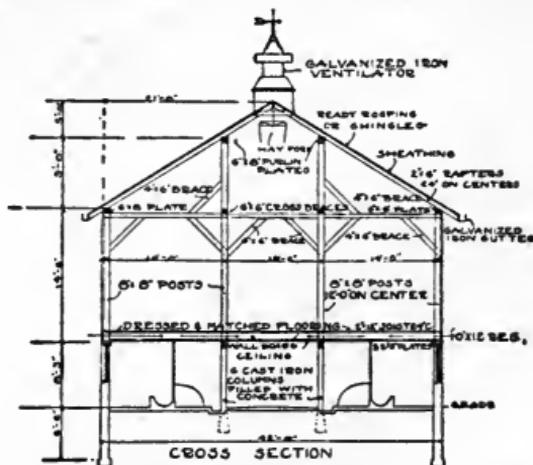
Cross Section of Old Style Timber Frame Barn, 42 Feet in Width
